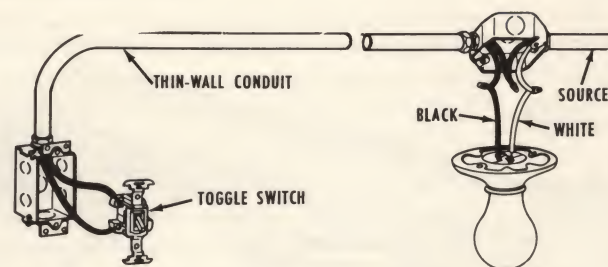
SWITCH ADDED FOR EXISTING LIGHT
